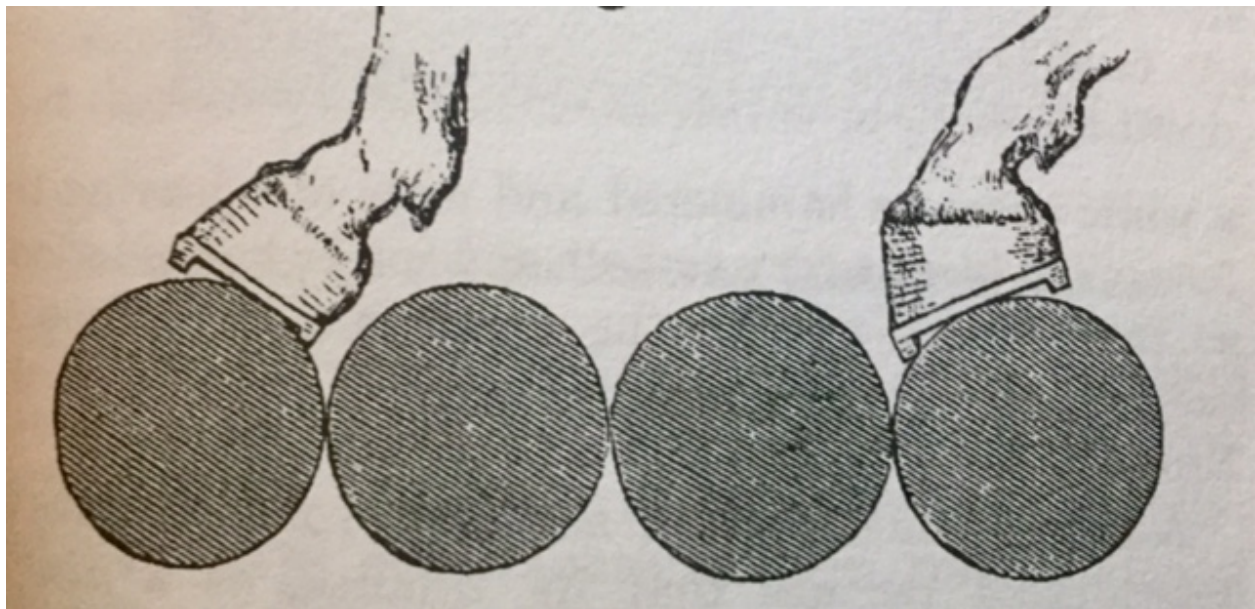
Foot-hold on the Cobblestone Pavement*, Source: Frank Grant Johnson, *The Nicolson Pavement, and Pavements Generally*, Fig. 7. New York: W.C. Rogers & Co., Printers and Stationers, 1867.
